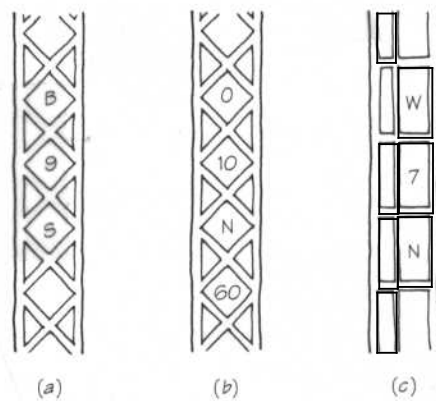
Deformed reinforcing bars. (Courtesy of Concrete Reinforcing Steel Institute.)
